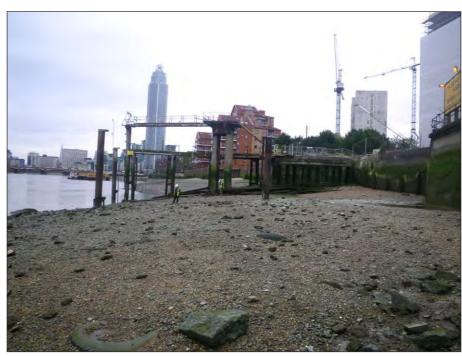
View to east across the Site showing river wall (HEA 1F) and extant concrete
